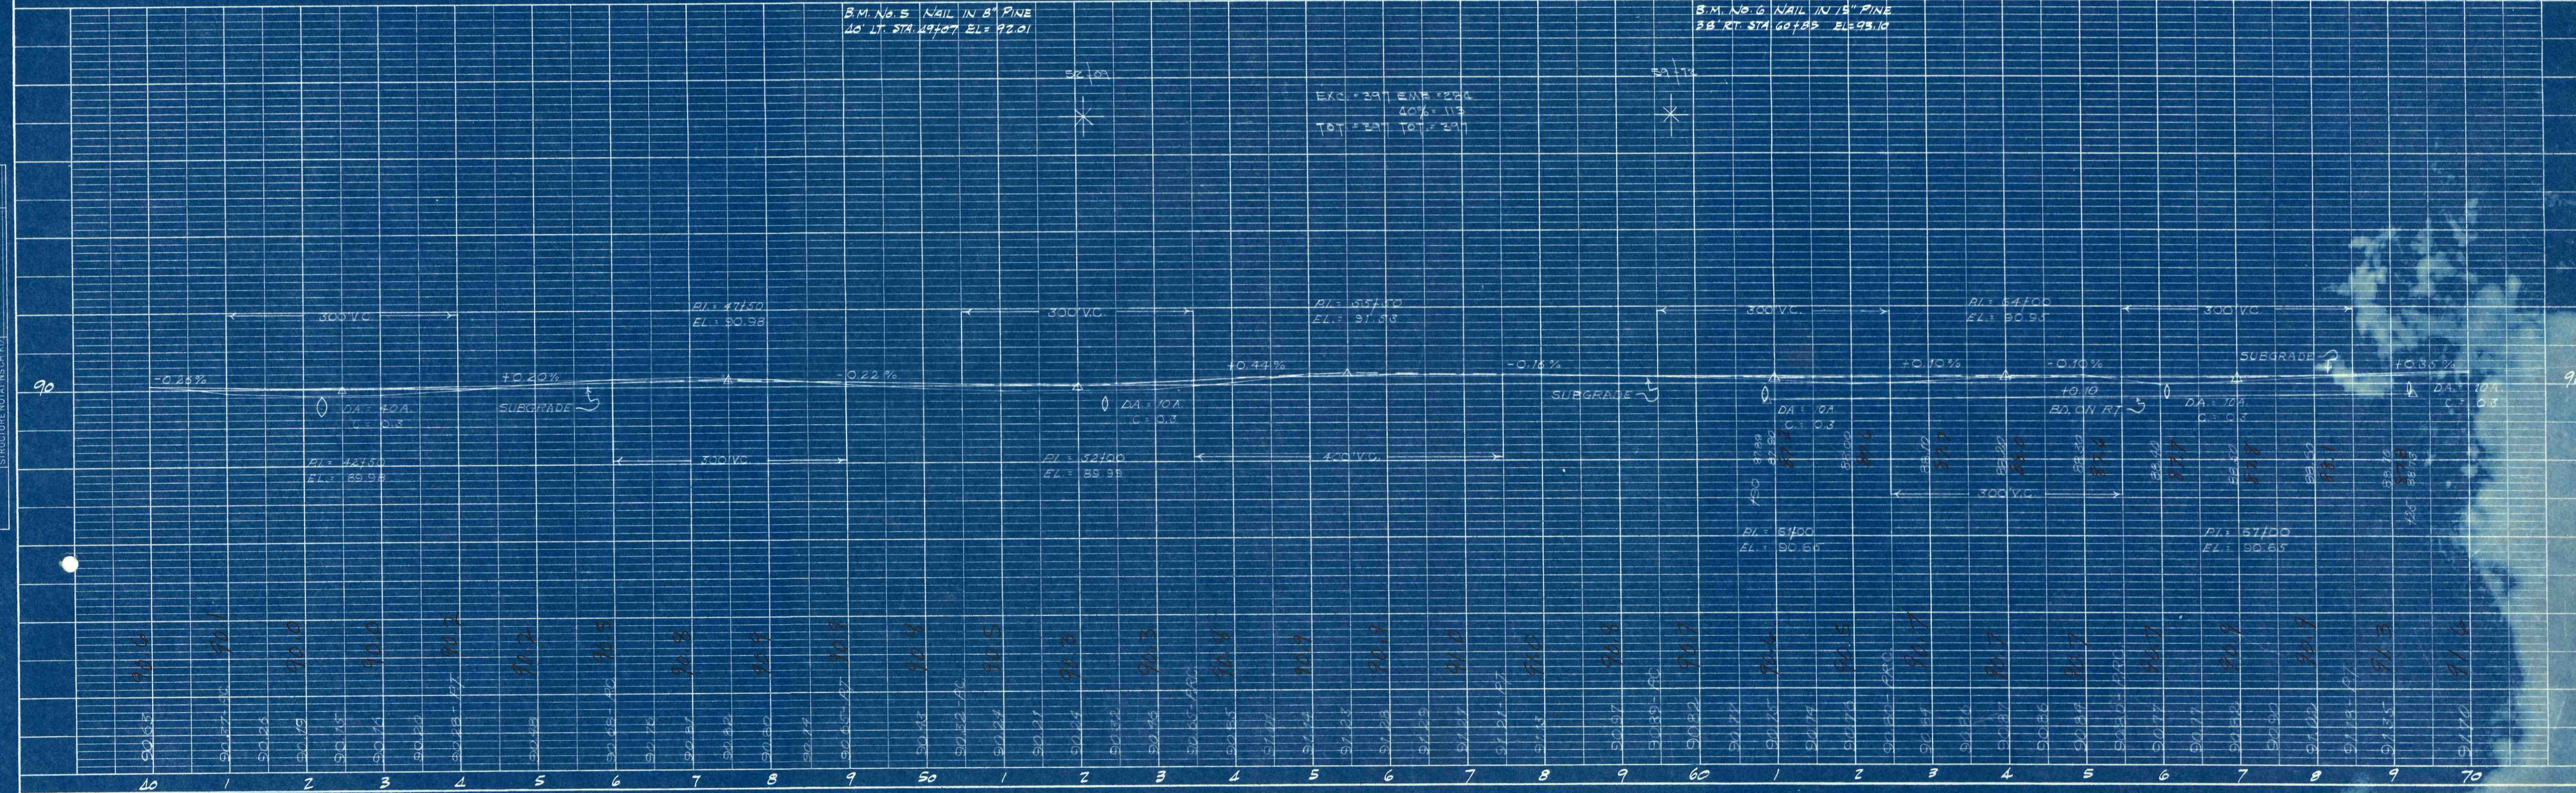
PLAN - PROFILE, O. P. R. & R. E. STANDARD
